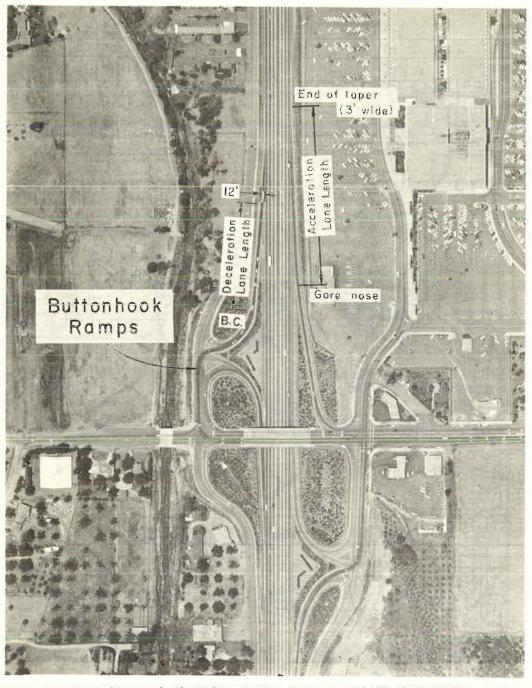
Example of modified diamond ramp and typical buttonhook ramp.
